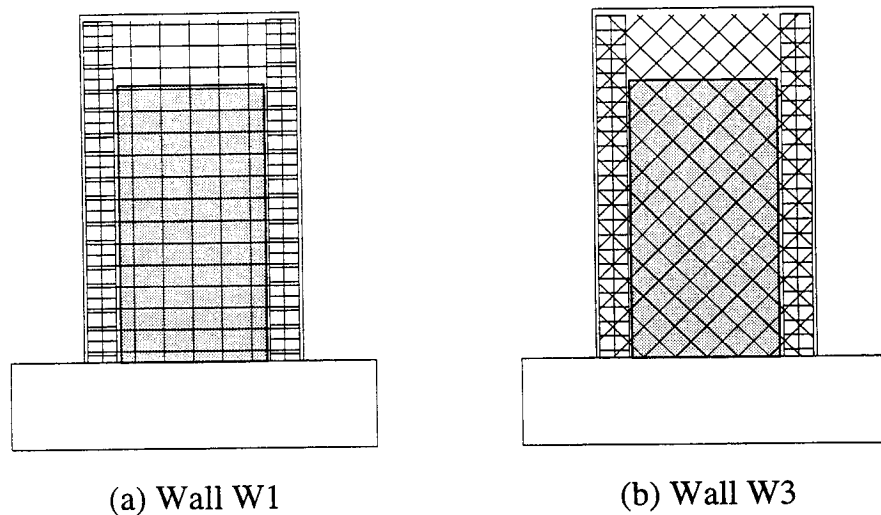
Layout of Longitudinal and Web Reinforcement in Two of the Specimens
